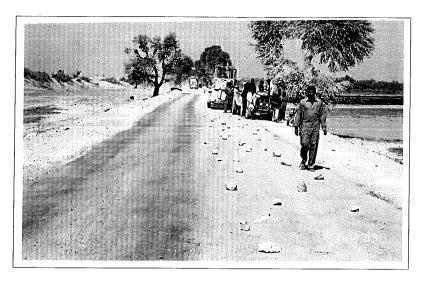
A 'good' section of the old road (26 km) improved with DST.
